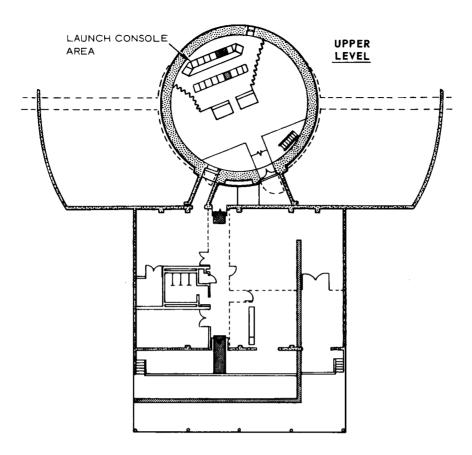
WFC BLOCKHOUSE FLOOR PLAN
